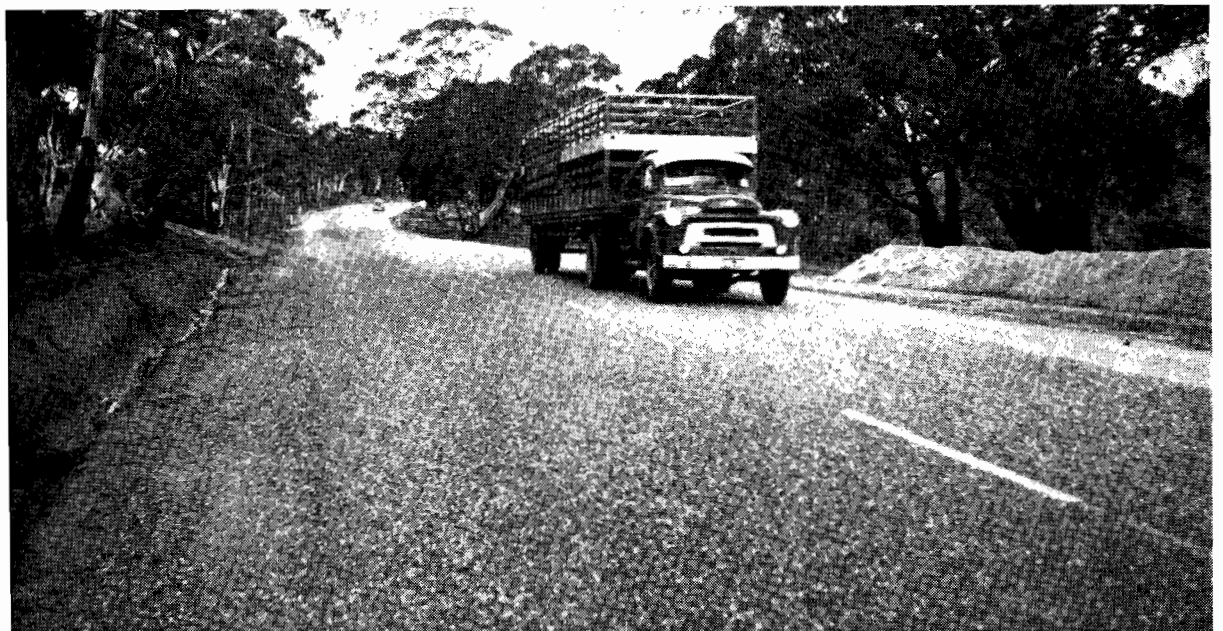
Shire of Metcalfe. Reconstructed and widened Elphinstone–Harcourt Road at approximately 2.6 miles.
